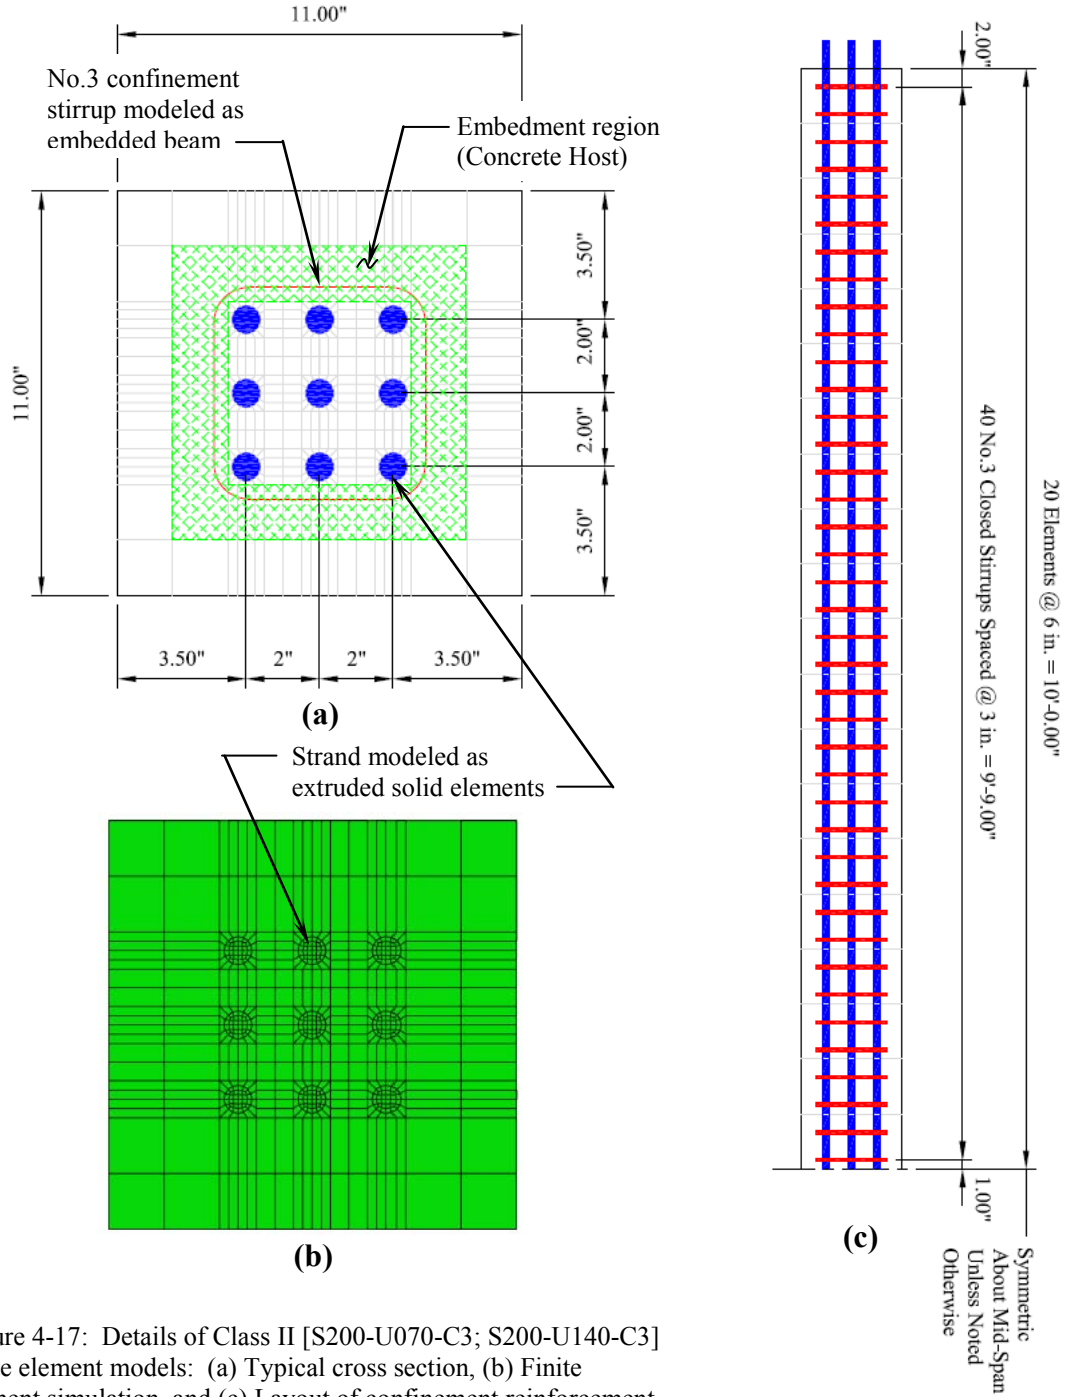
Details of Class II [S200-U070-C3; S200-U140-C3] finite element models: (a) Typical cross section, (b) Finite element simulation, and (c) Layout of confinement reinforcement (No.3 closed stirrups spaced at 3 in. on center)
